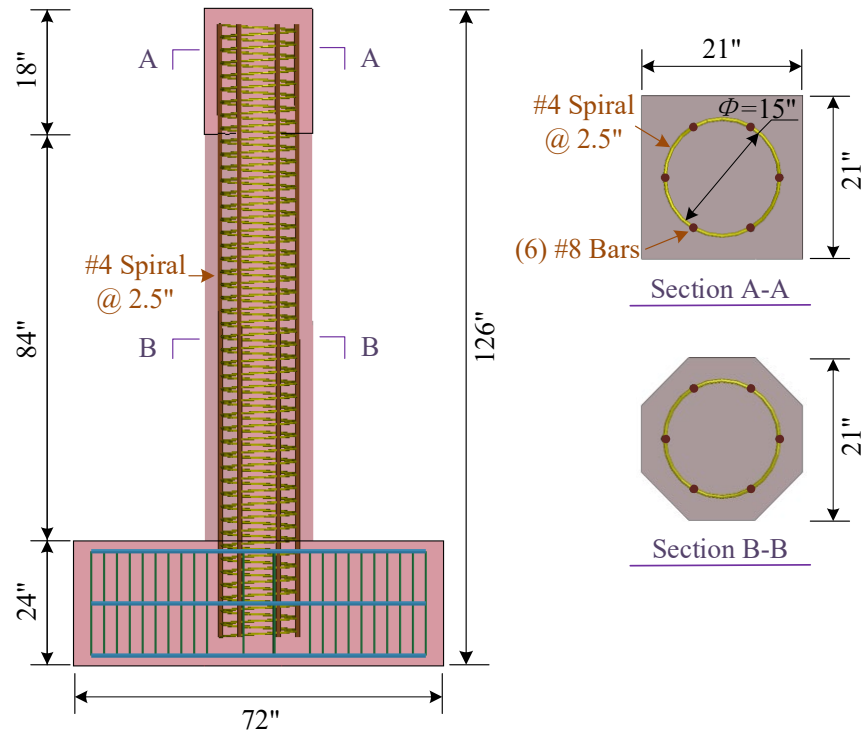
provides a summary of the design details for the joint regions of the column-footing specimens. The dimensions of the precast footing were six feet in length, three feet in width, and two feet in depth. It incorporated a total of 18 No. 8 longitudinal bars, which were enclosed by No. 4 double hoops with 2.5-inch spacing. Notably, there were two No. 4 double hoops positioned in the middle of the footing, right below the column, for additional reinforcement.
